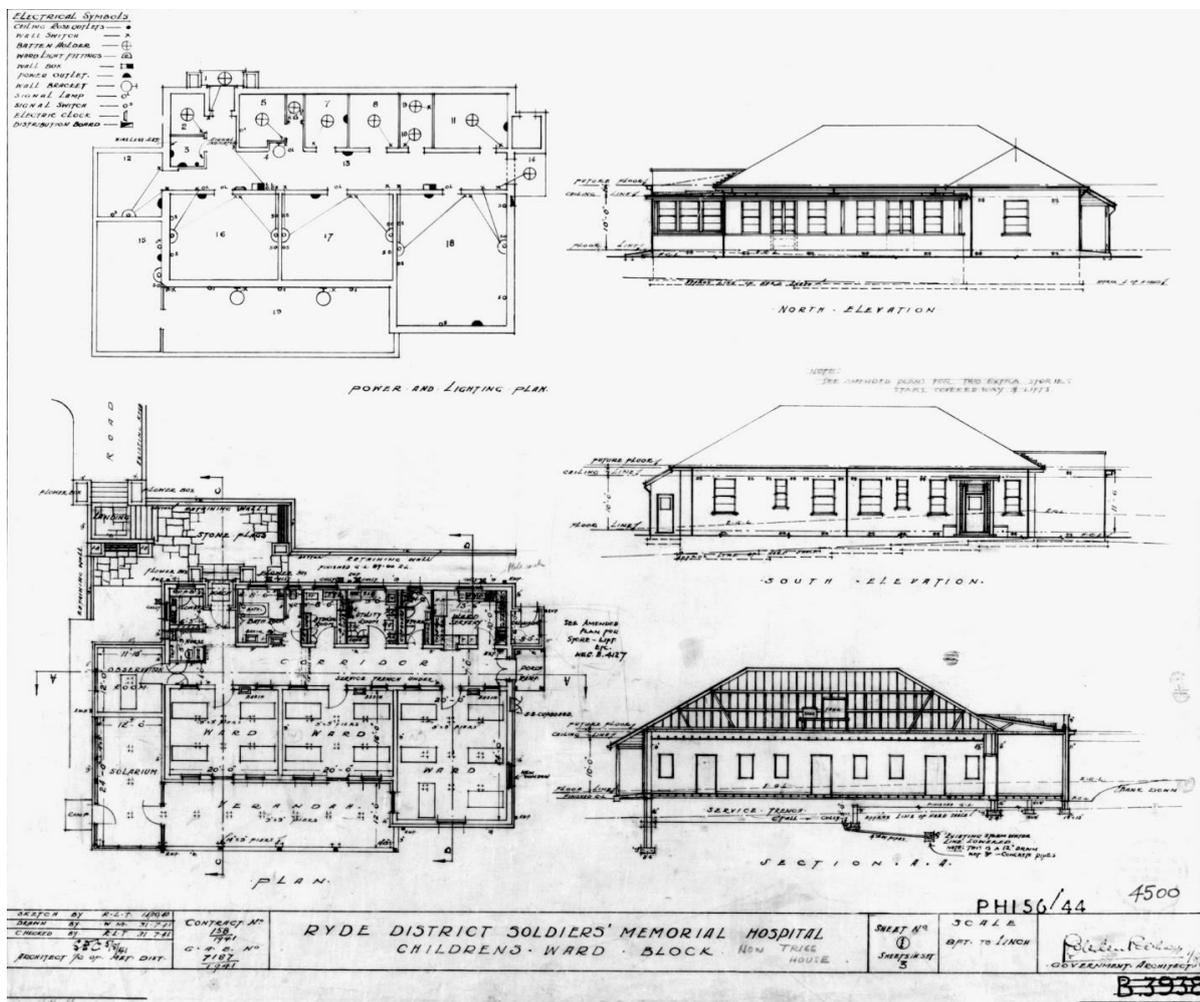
Plan, section and elevations of Trigg House (single storey plan) (1941).
